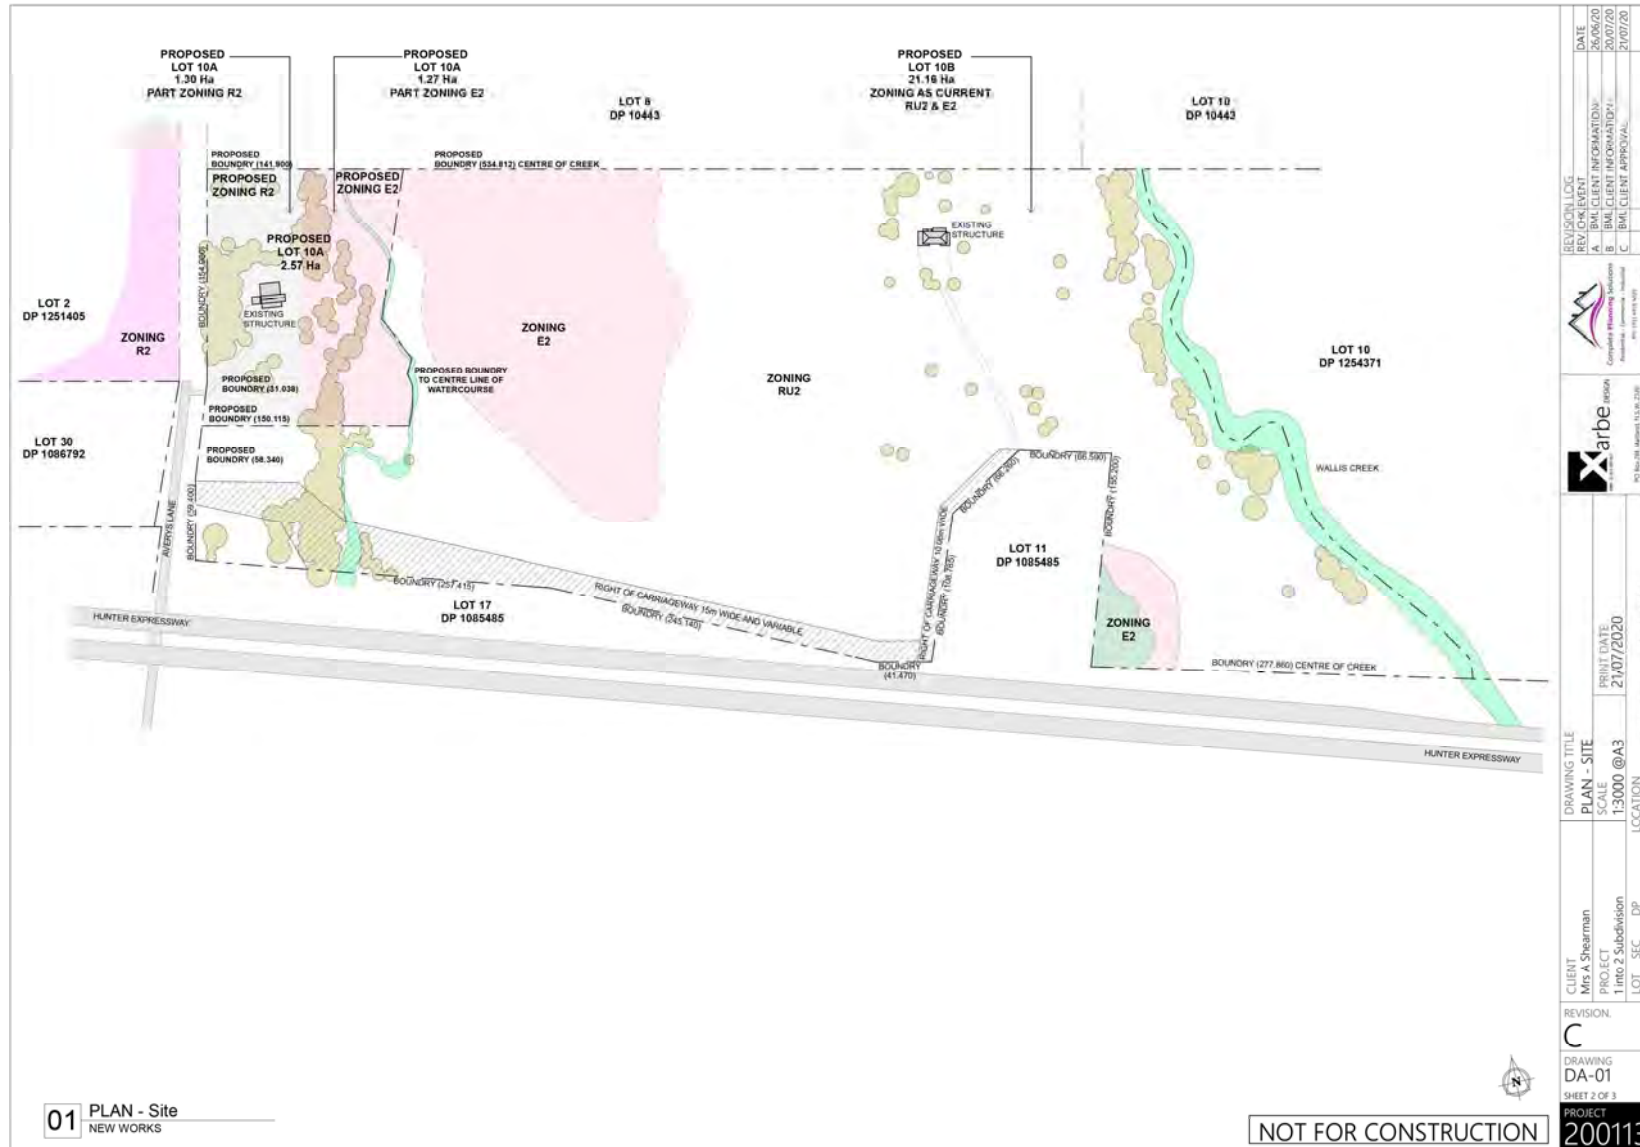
Original site rezoning plan detailed (from Complete Planning Solutions, dated 21.7.20)
